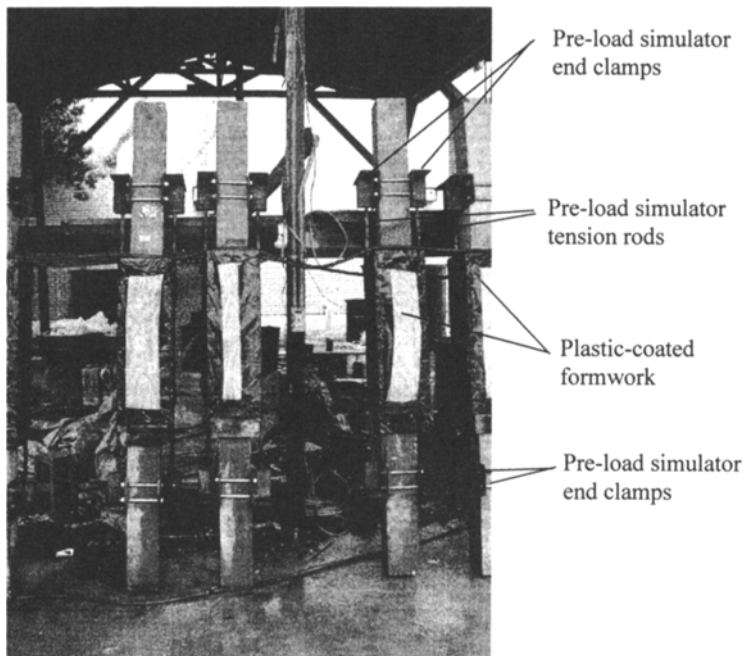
Piles with jackets and pre-load simulator prior to concreting.
